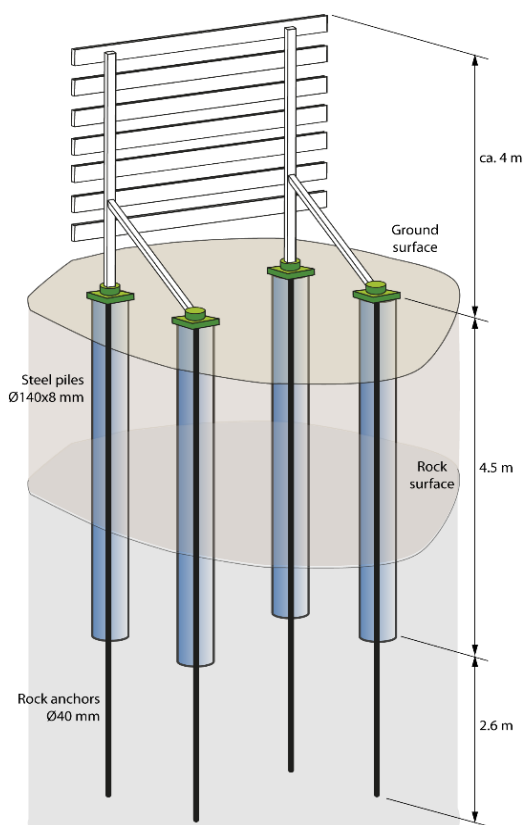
Snow fence and foundation support system with micropiles and anchors which are drilled and grouted in bedrock.
